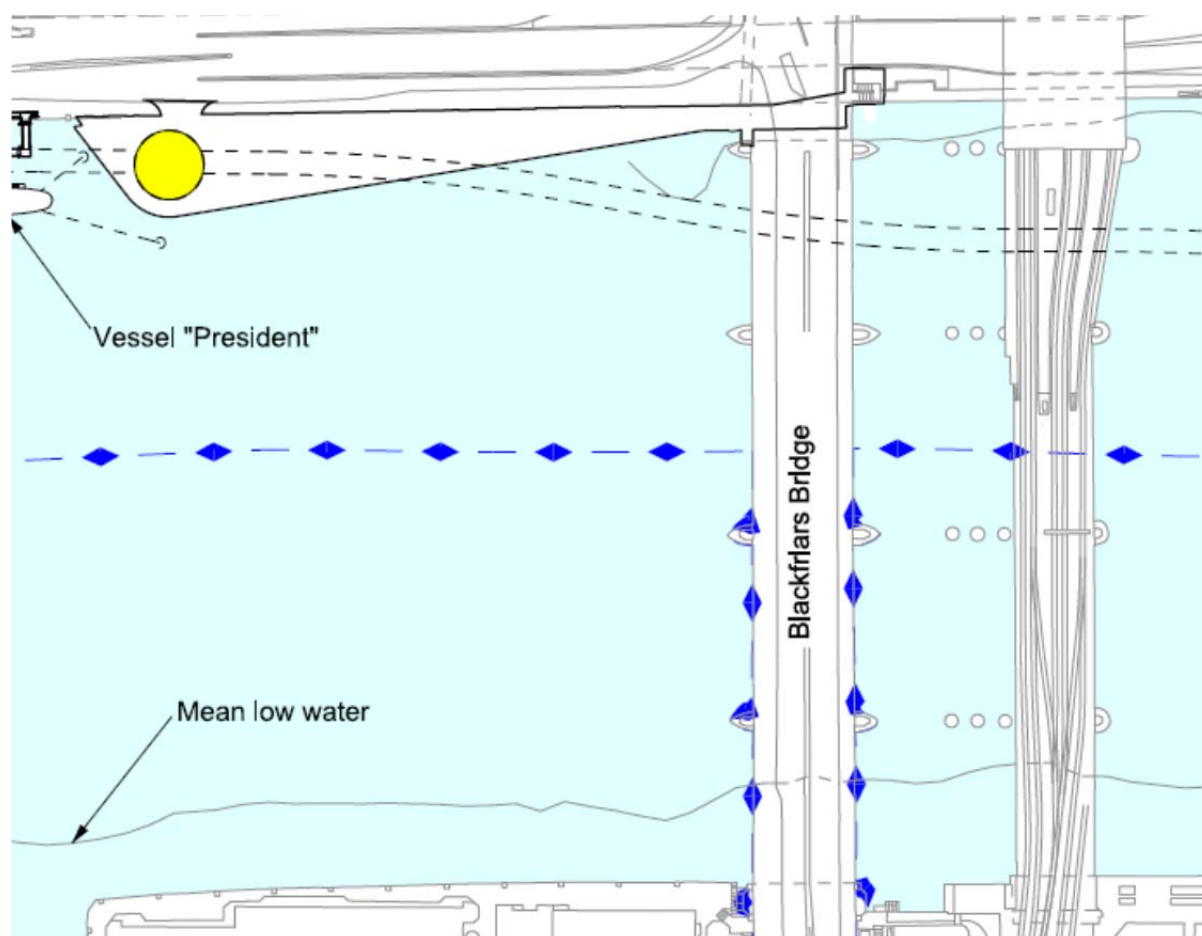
Plan of River bed Blackfriars Road and Rail Bridge
